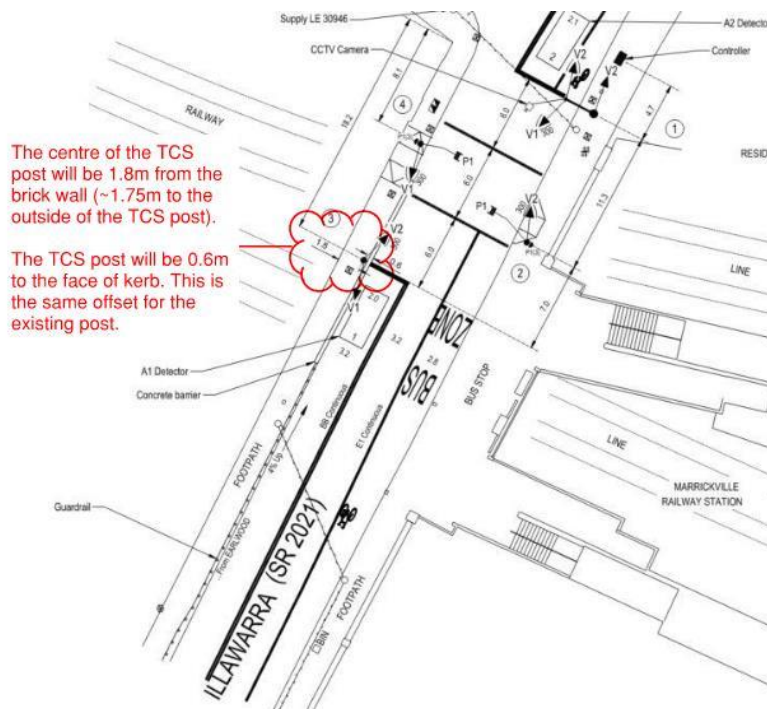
TCS plan - Signal post adjustment at Illawarra Road
